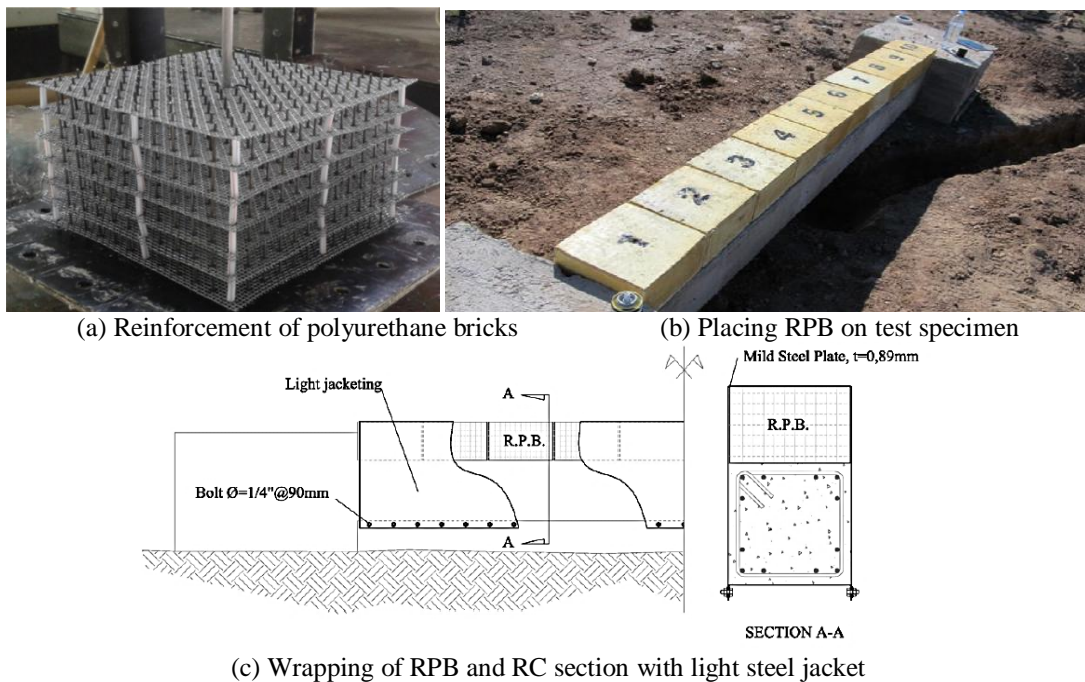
Test setup for retrofitting alternative using reinforced polyurethane brick with light steel jacket¹²
